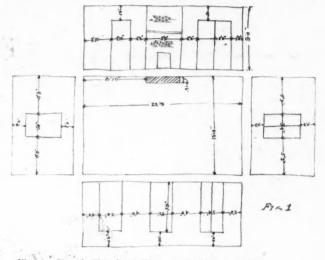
Rough Sketch of Walls and Ceilings of Each Room.
